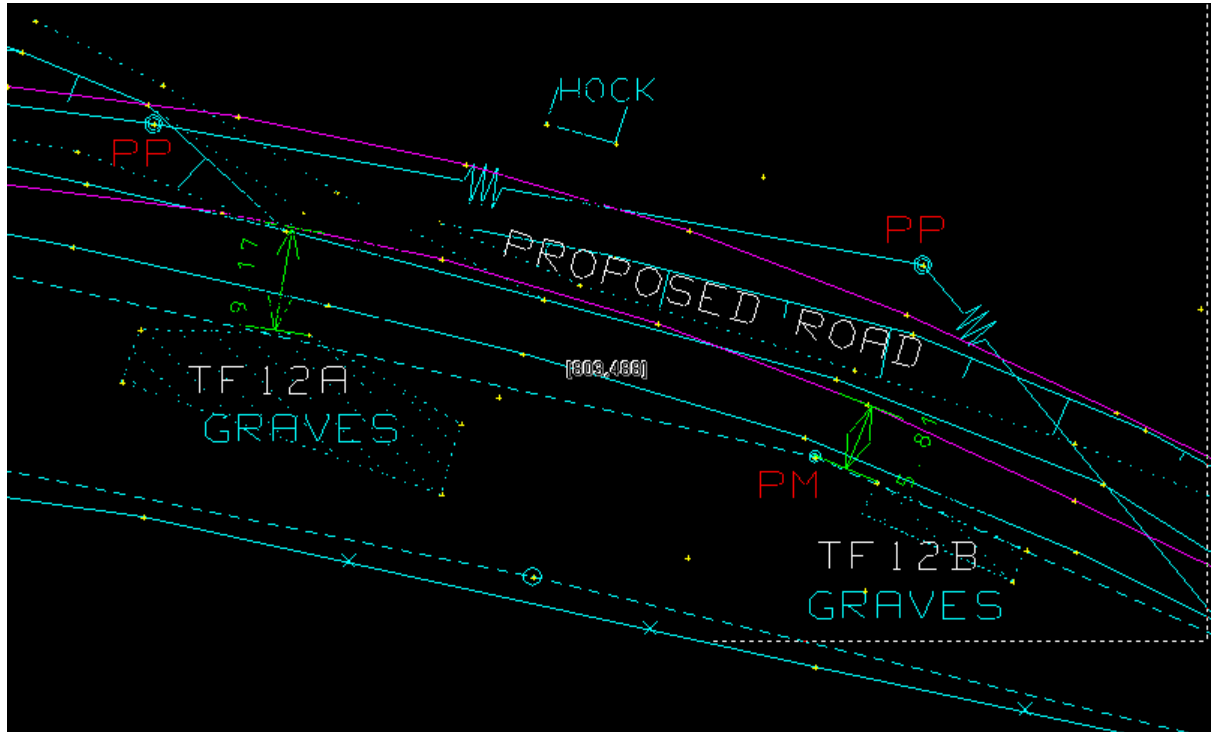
Position of grave site TF12 adjacent to the proposed road upgrade.
